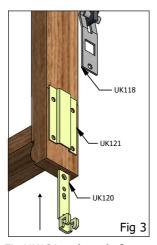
Fix UK121 to horn before sash is in place (Penetration of screws shoould be 10mm minimum). When sash is fitted, UK120 is slid into UK121 as shown, and it's bottom edge should be 10mm above the bottom of the horn.
